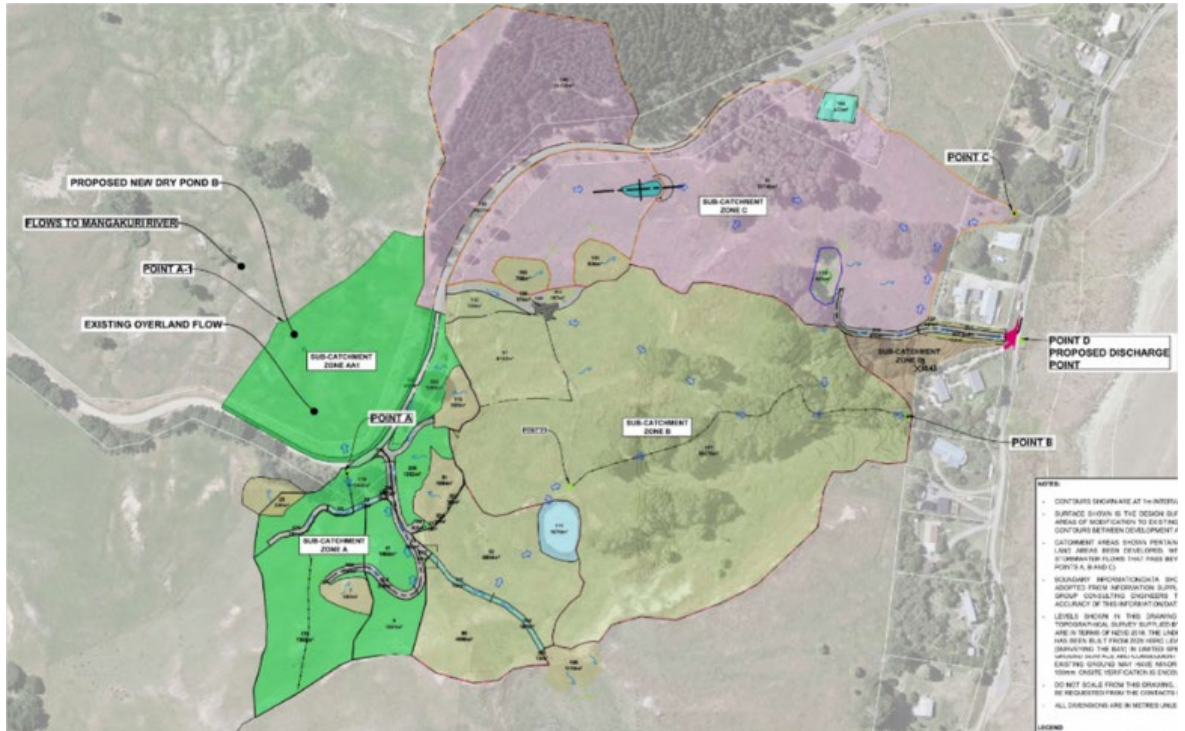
Post-development Stormwater Catchment Plan (Source: Strata Group)
